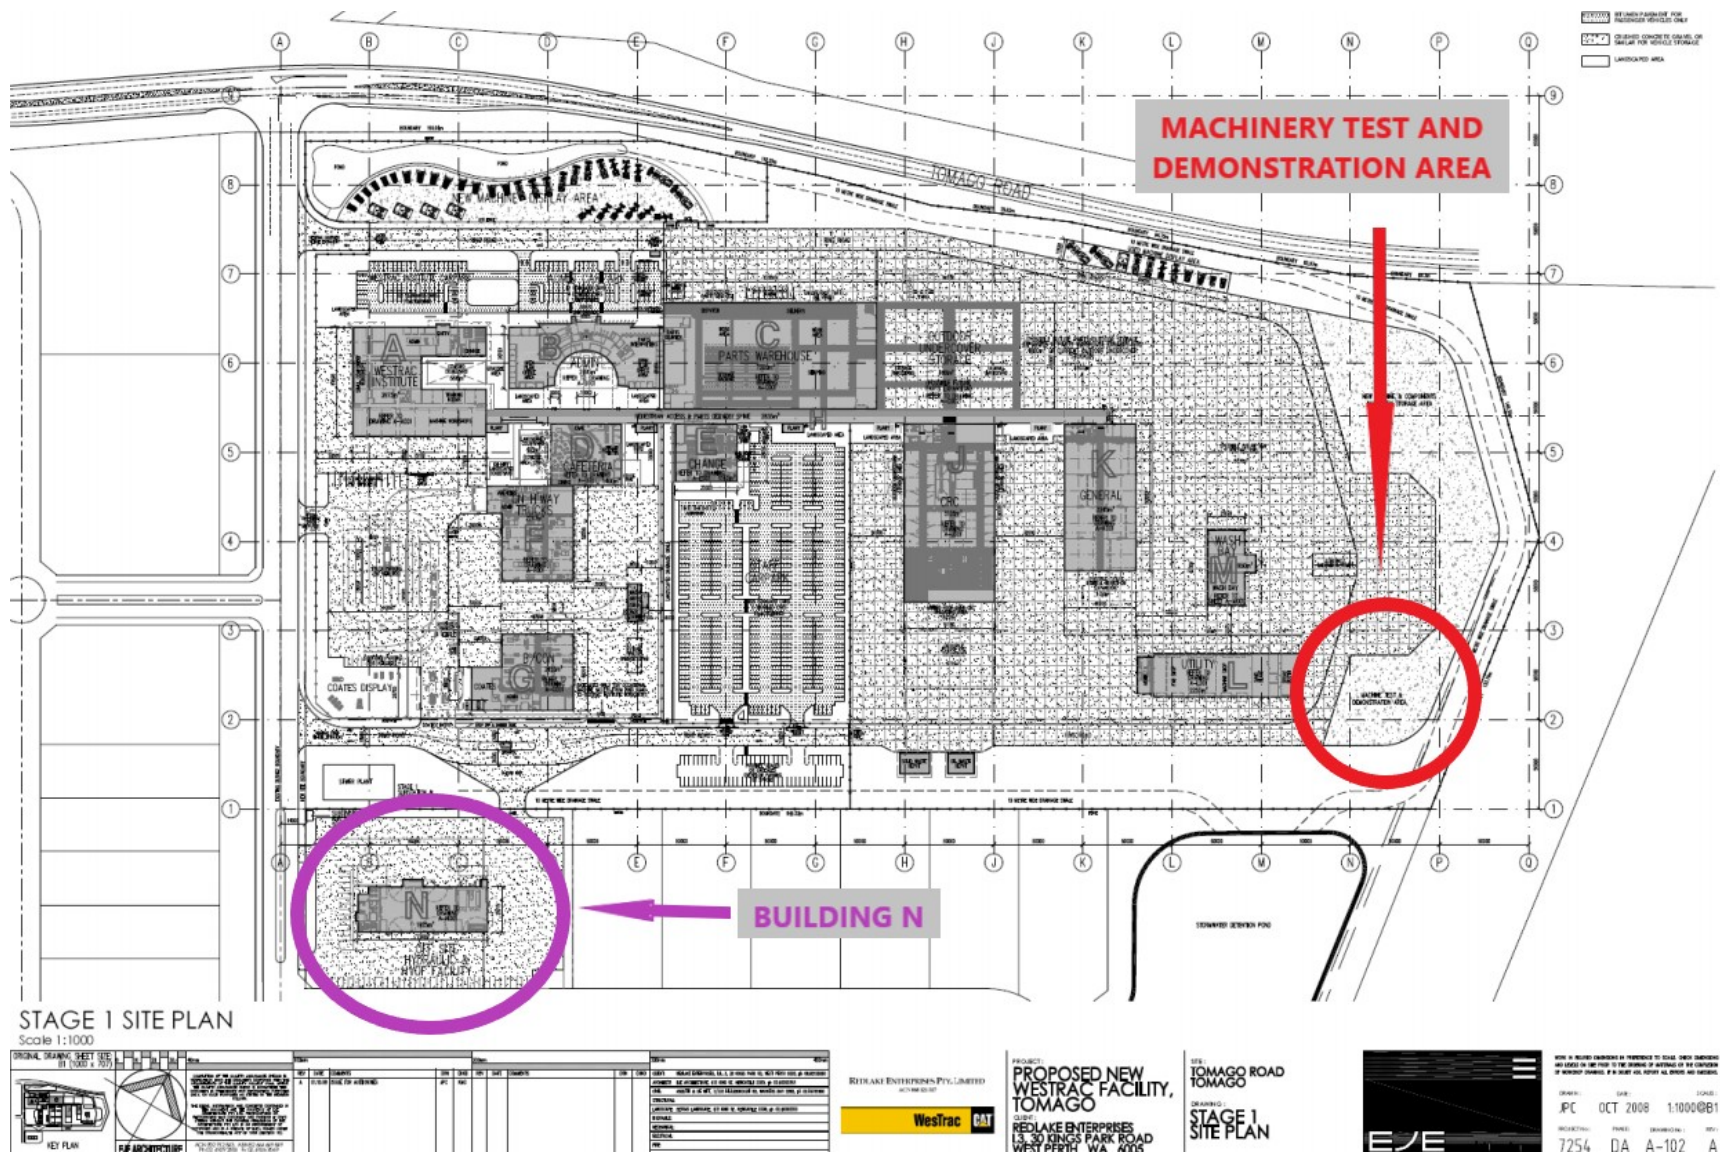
| MP07\_0086 – Approved Development Layout – Westrac Facility
